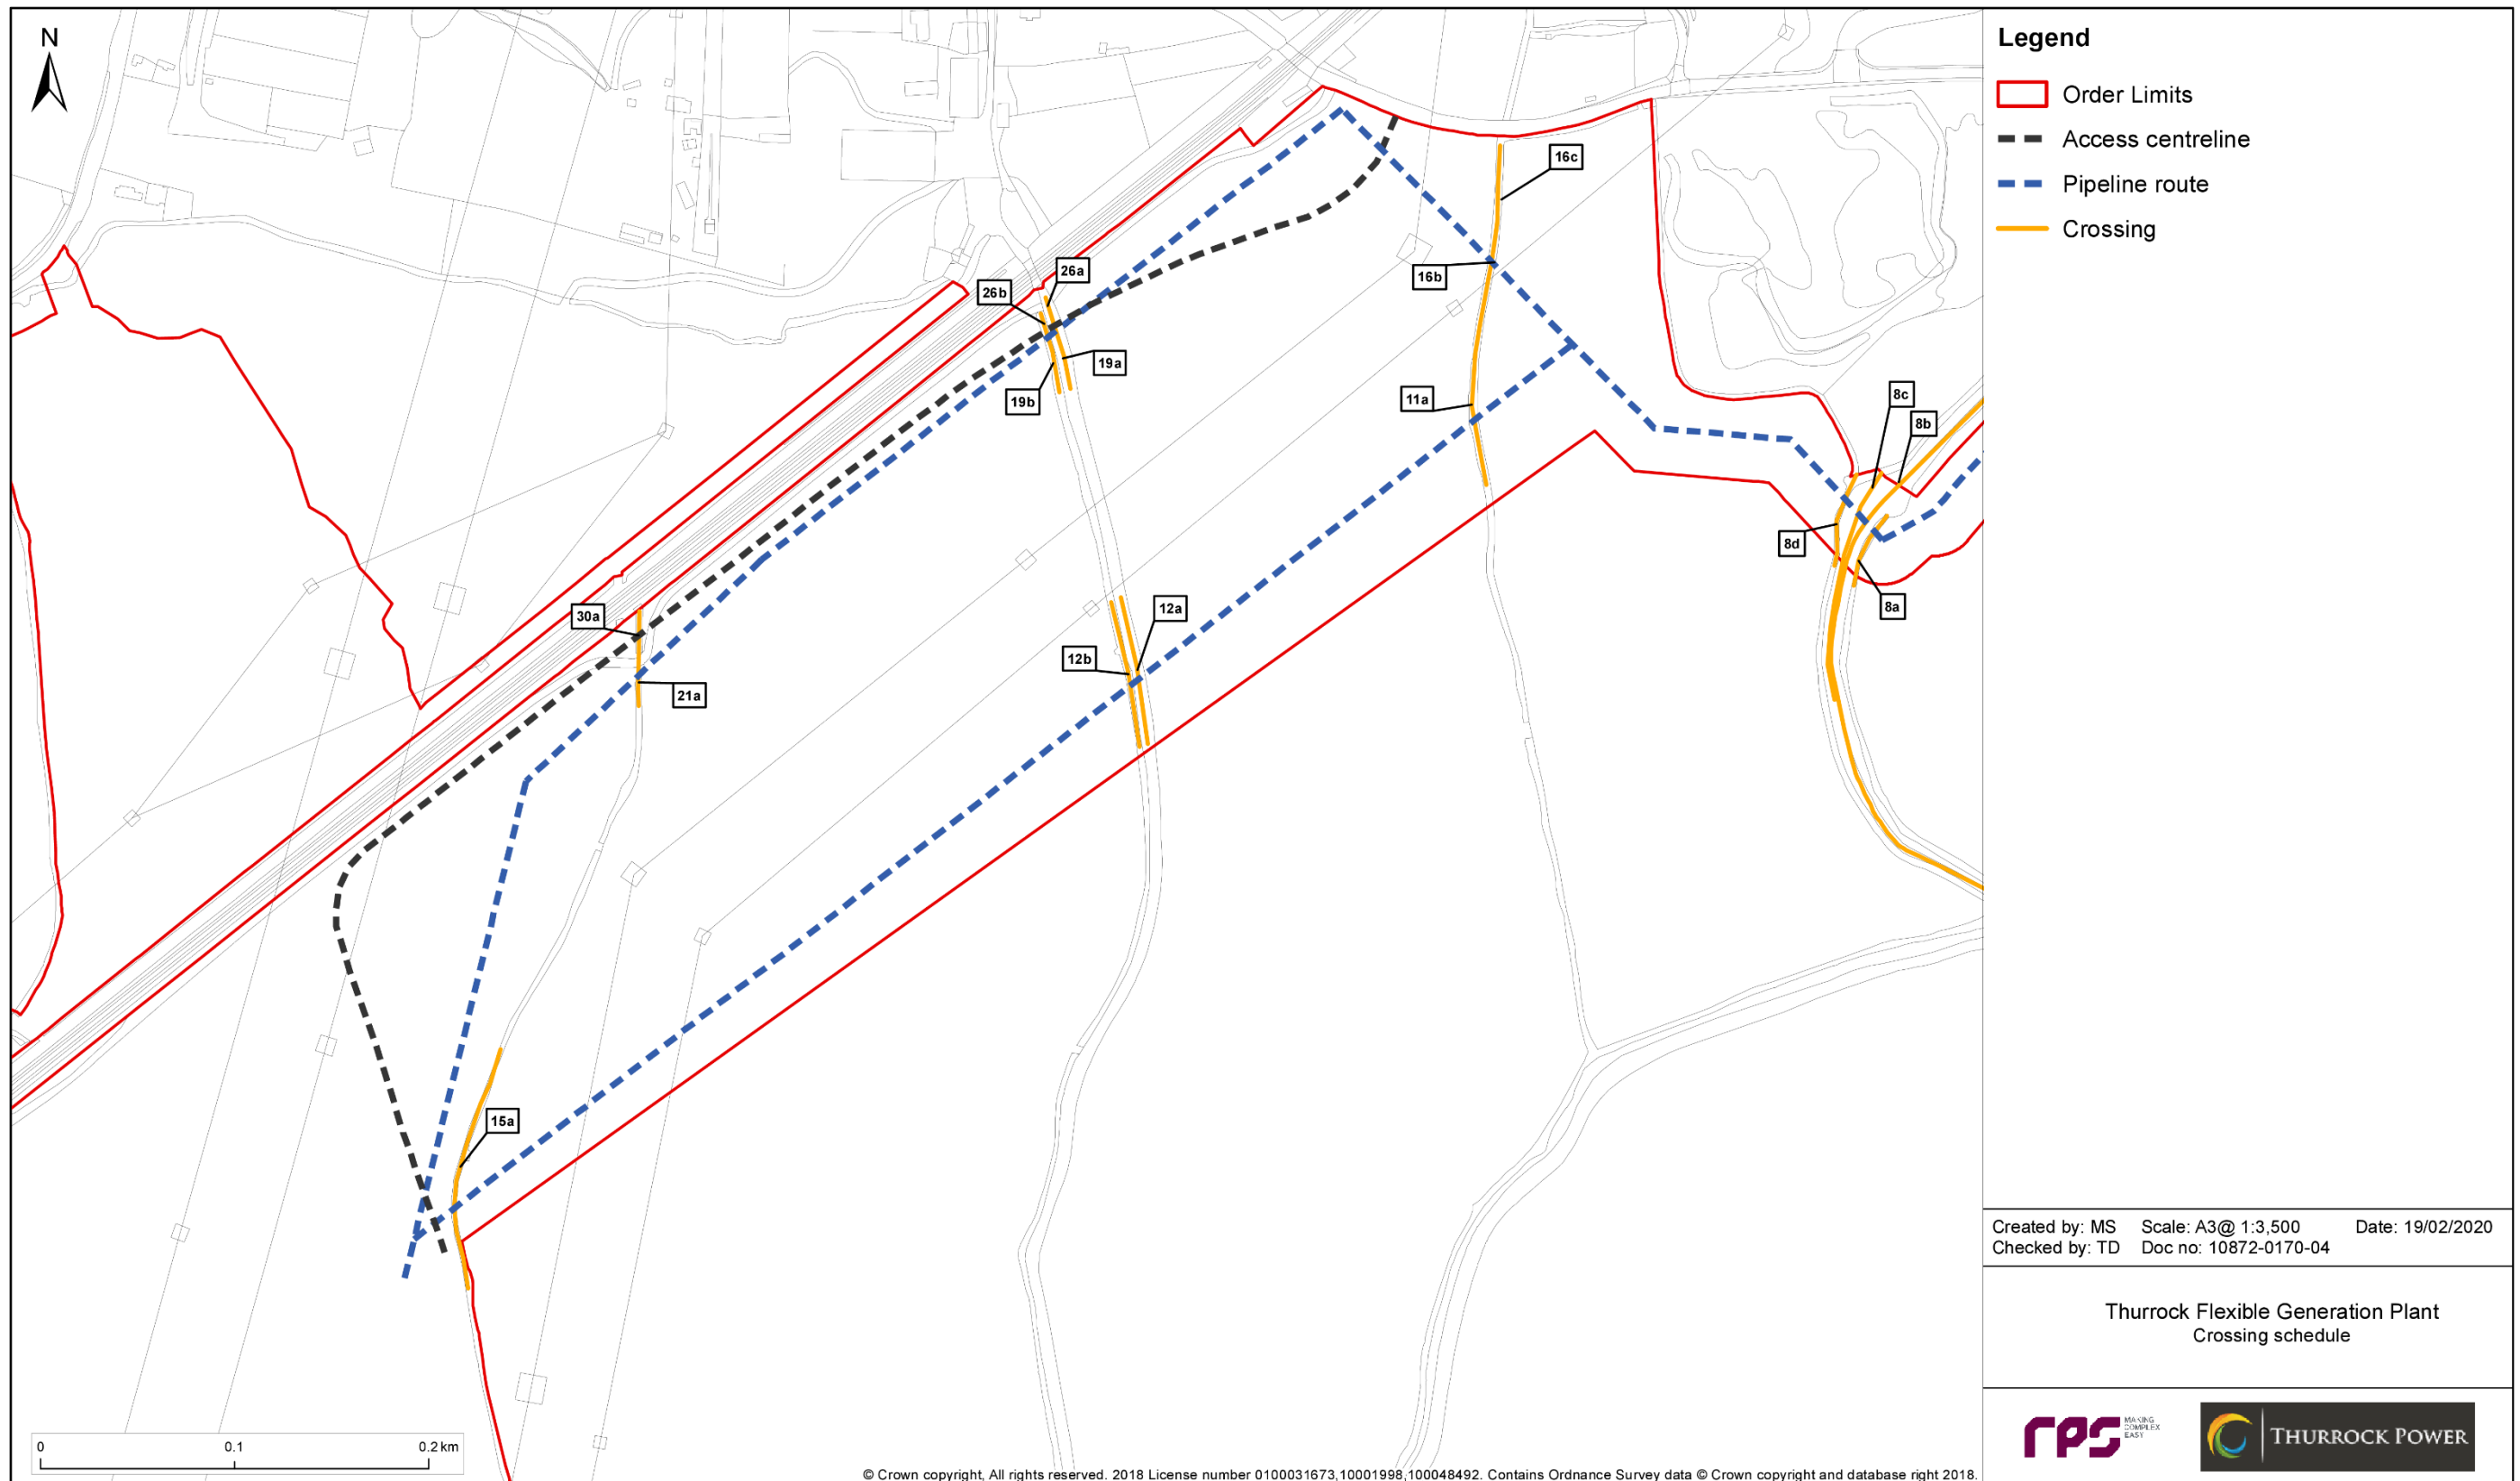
Gas pipeline, underground cable and access road crossings – sheet 3.
